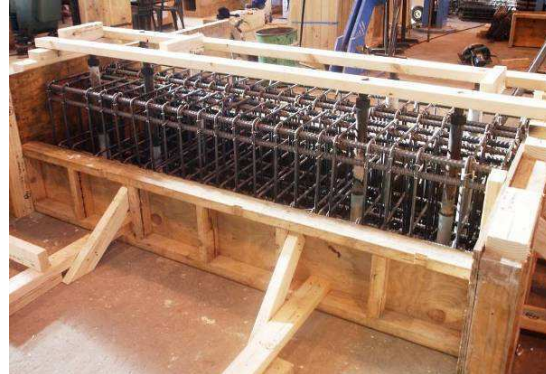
Steel reinforcement and formwork ready to cast lower half of support beams
